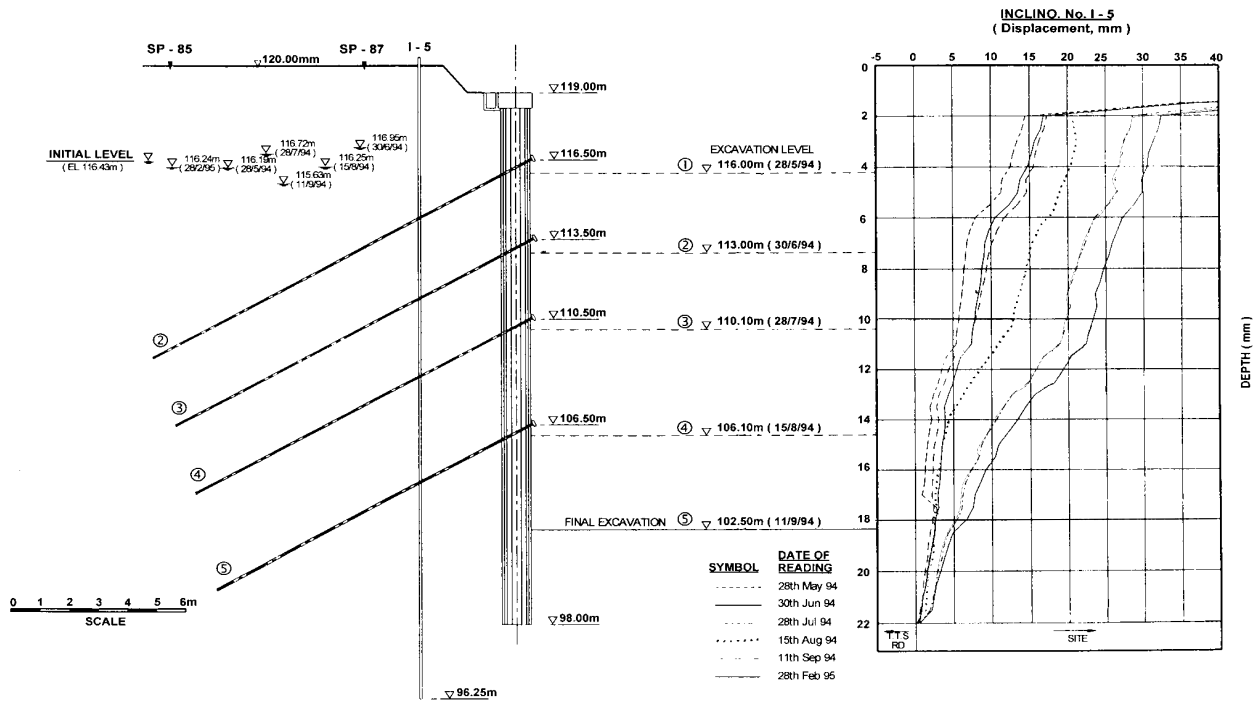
Typical Excavation Profile at CBP 3 (I-5)
